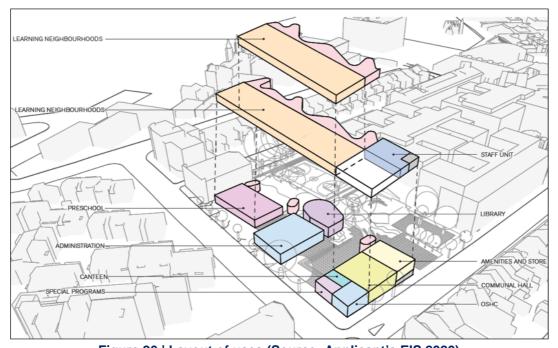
| Layout of uses (Source: Applicant's EIS 2020)
